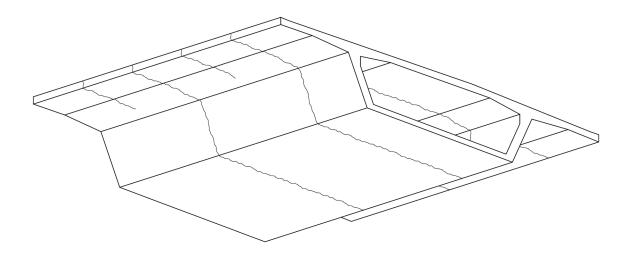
Superstructure Potential Crack Pattern for Direct Tension
